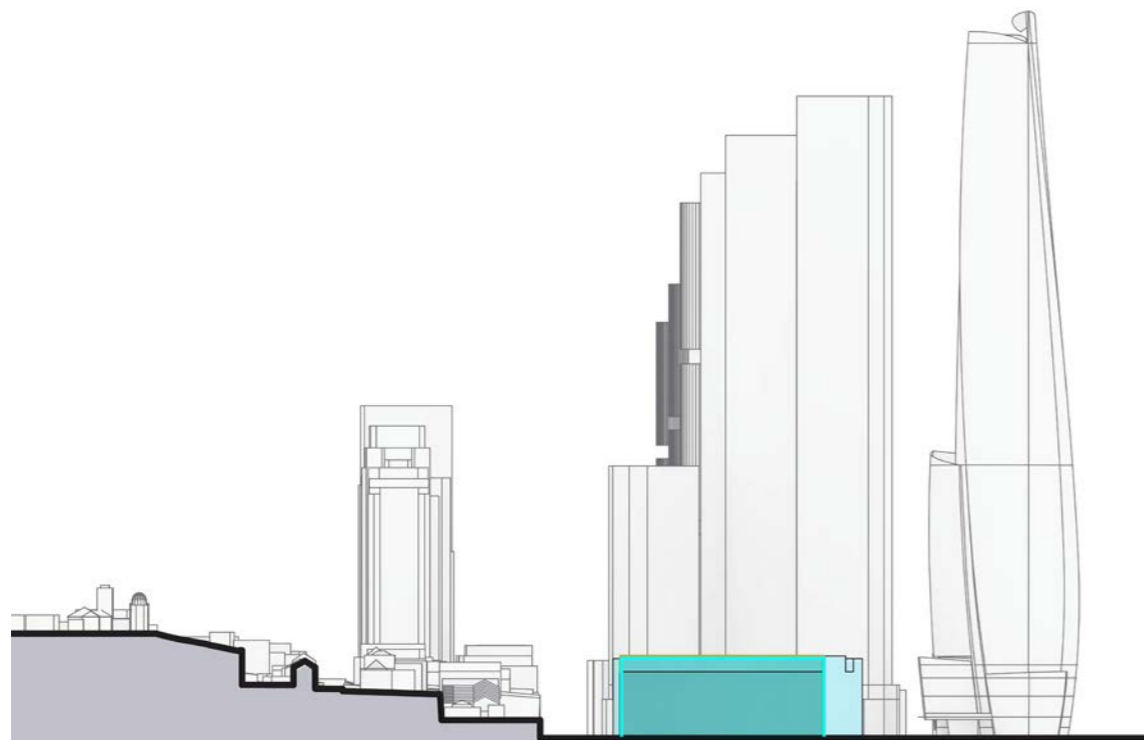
Approved Concept Plan (Source: HASSELL 2018)
